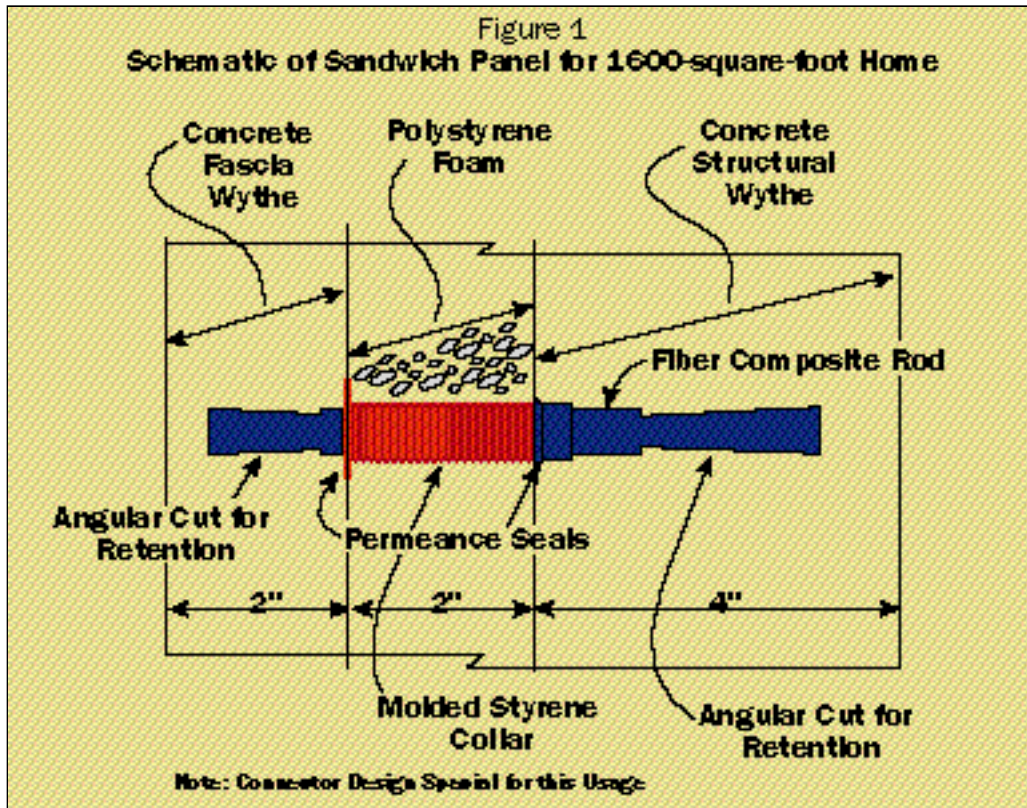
Typical cross section of a concrete-sandwich wall panel for the 1,600-square-foot home built by Castle Construction.
